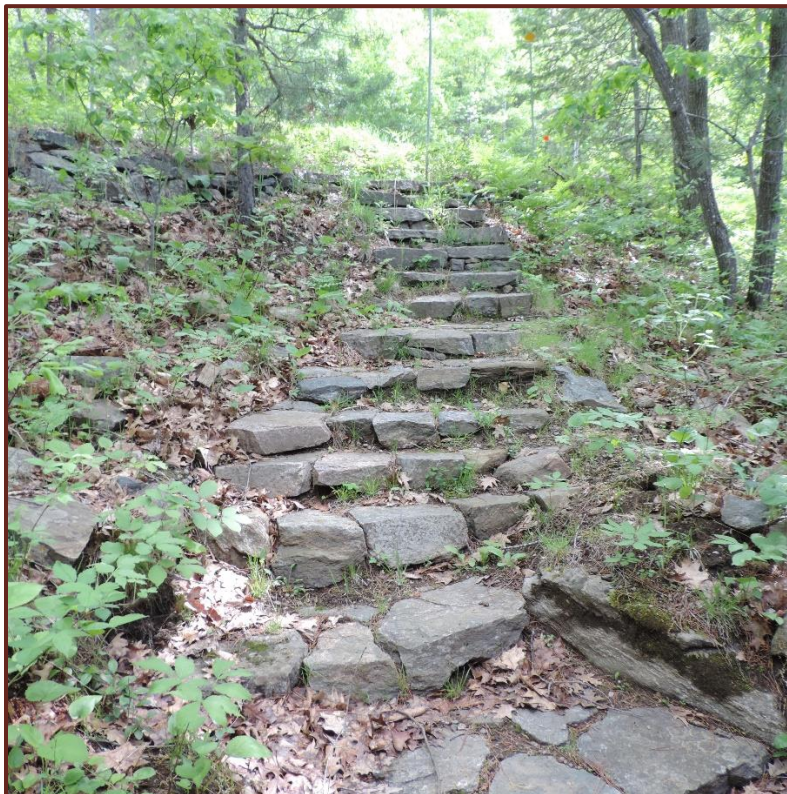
View of the stairs to access the cottage from Papineau Lake Road.
